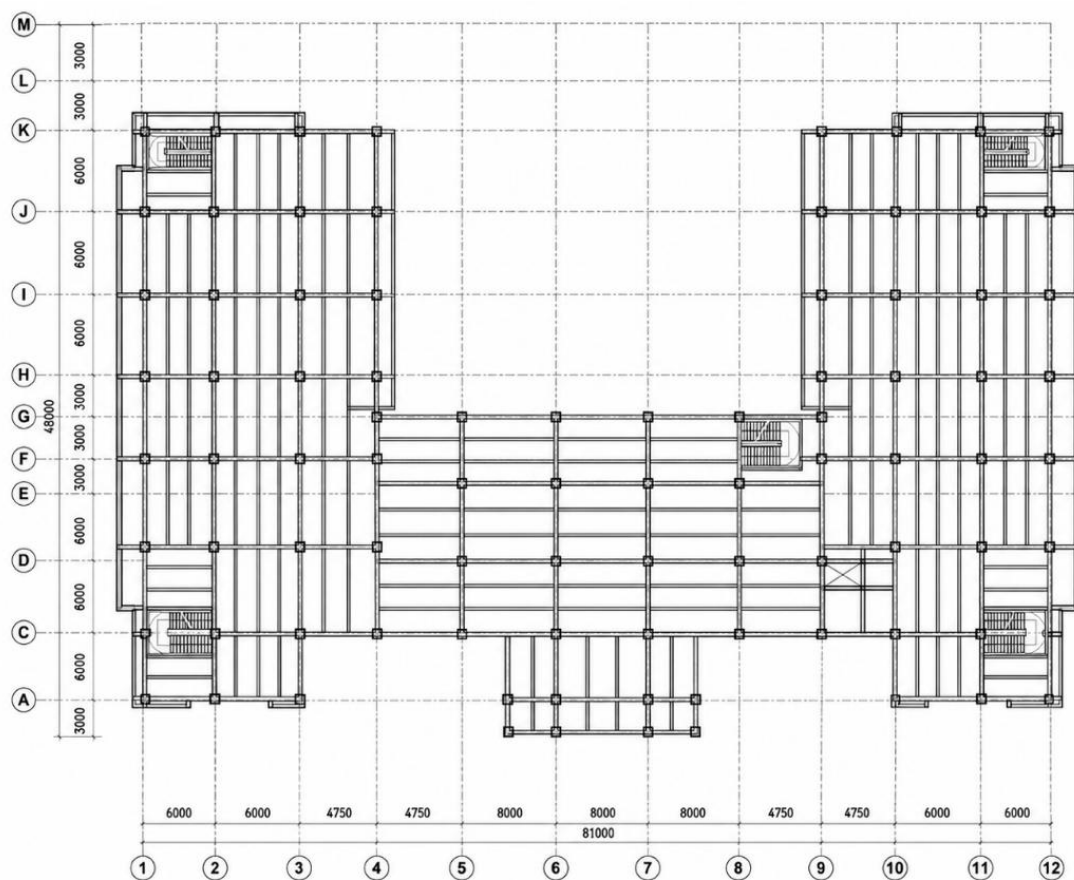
Structural plan and member-size schedule for the 6-story, 9-story, and 12-story models
